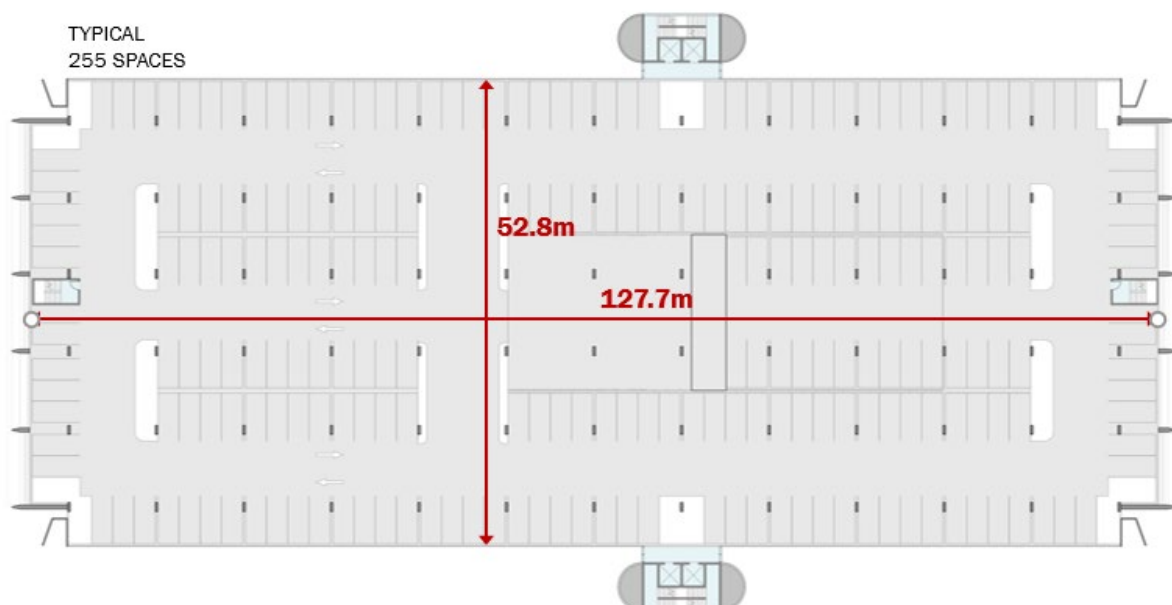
Drawing of the proposed carpark from above, showing width and depth, note that the stairwells are now proposed to be set further away from the building. (Source: BVN, Presentation to DAWE 15 November 2021).
